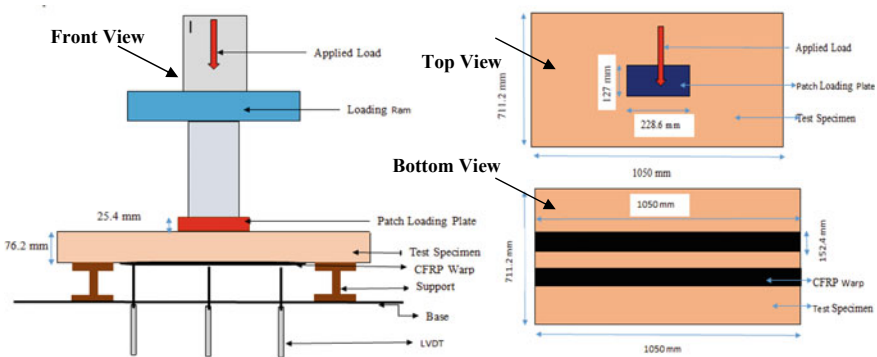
Schematic front, top and bottom view of test setup of specimen
